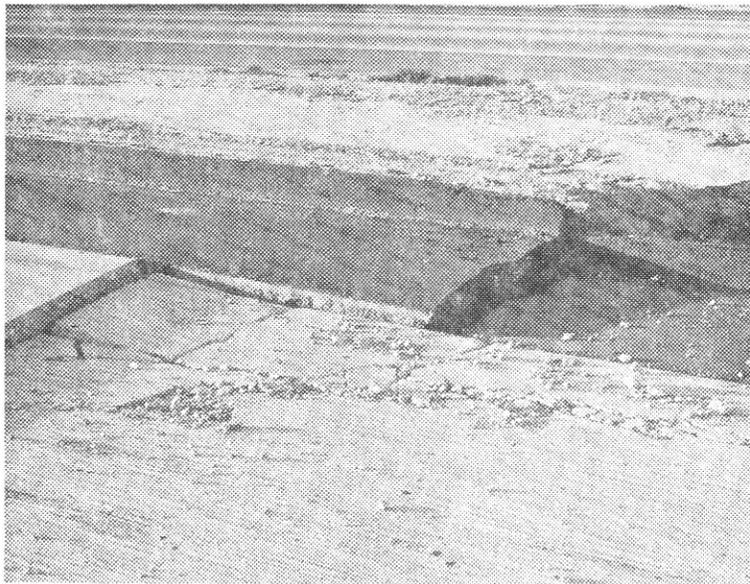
Vertical displacement along pavement slab joints near fill/cut contacts.
